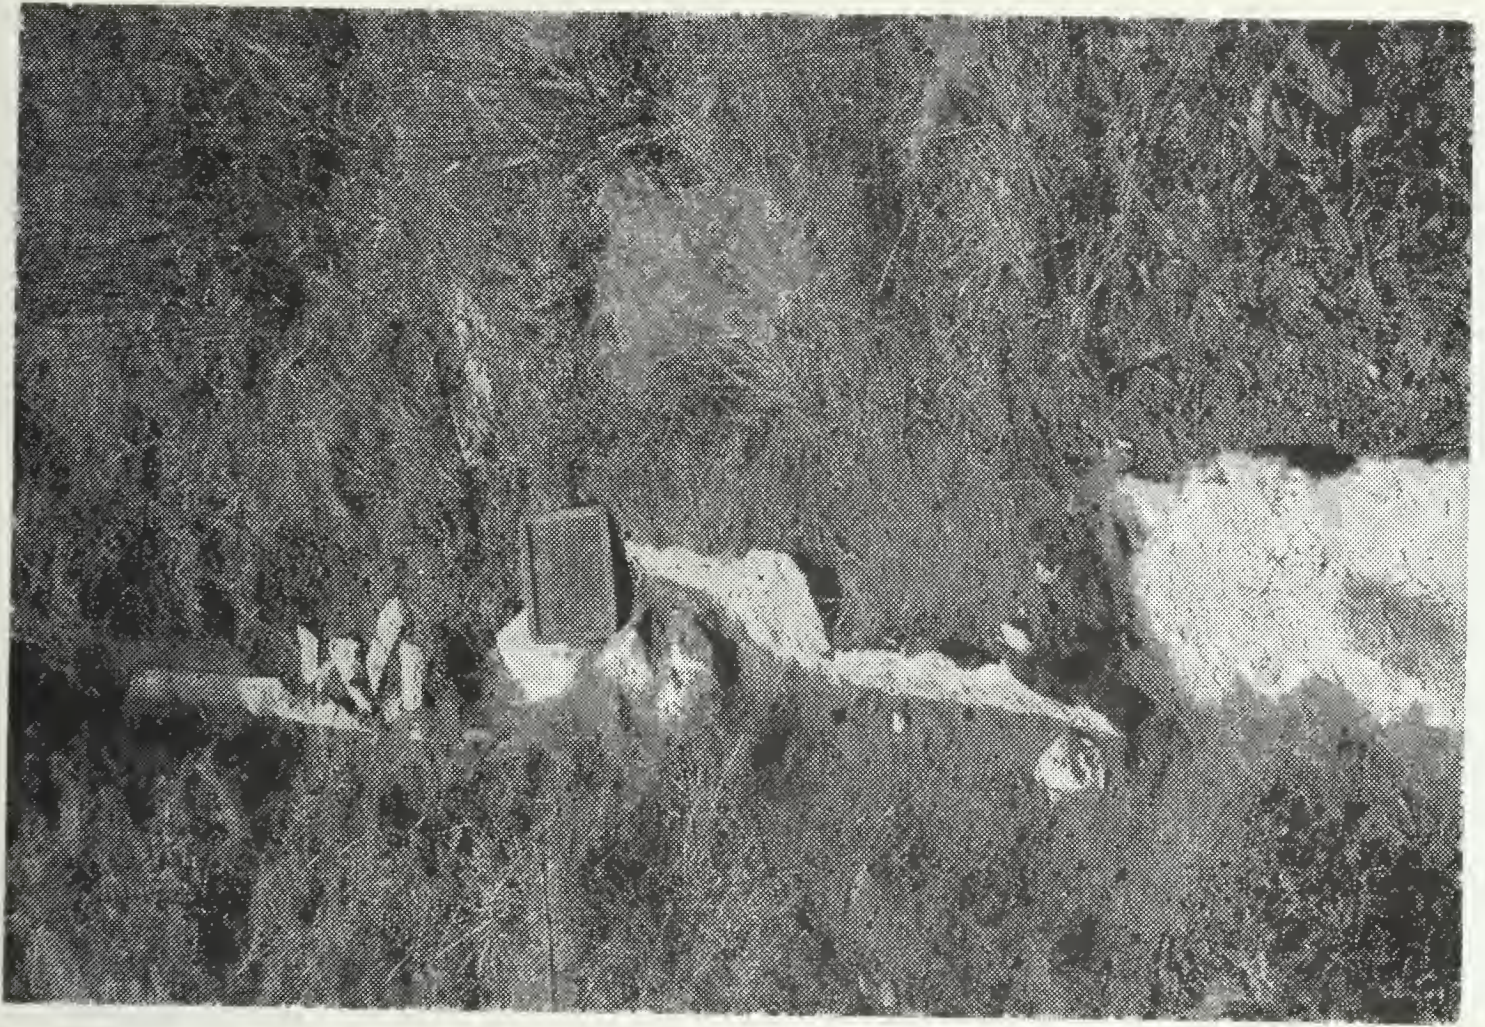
B. C Street Curb at the Douglas School Site, 1980.
